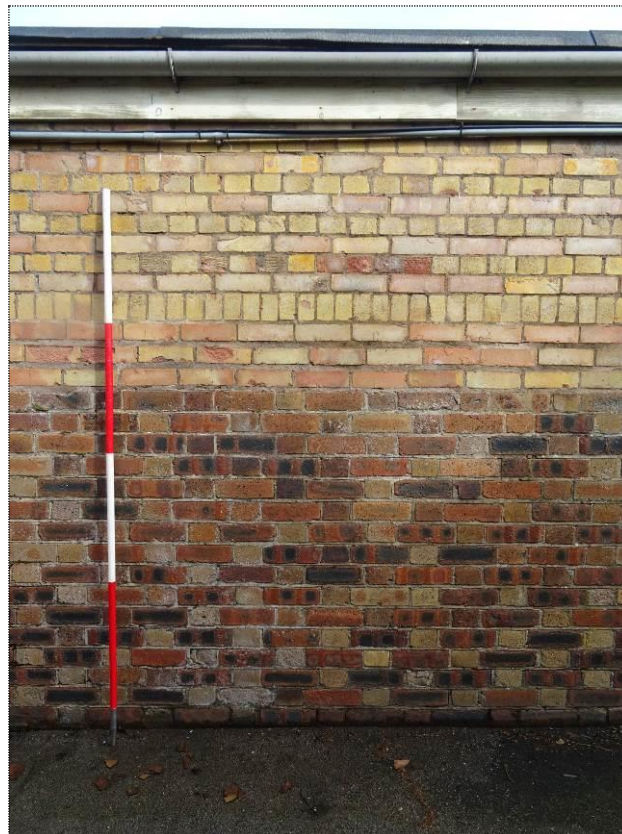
Multiple brick types within the southern elevation of Building E, suggesting periodic repairs
